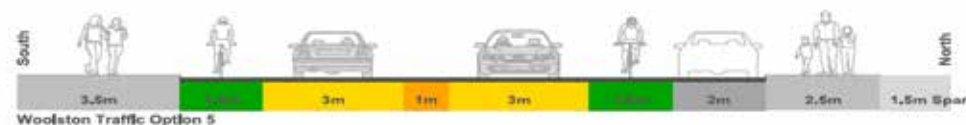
Ferry Road Corridor Study preferred road cross-section for Woolston.
